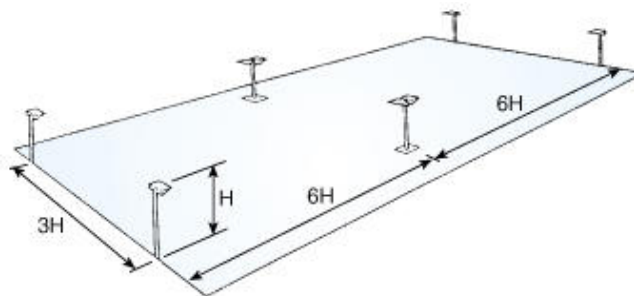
Typical layout for floodlighting open areas. H is the pole height to the luminaires.
